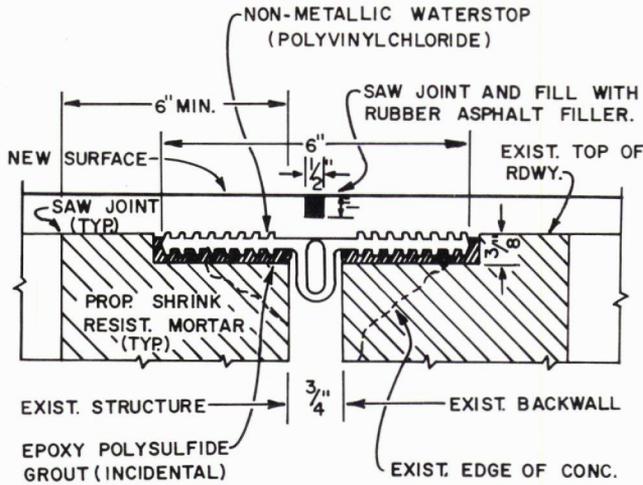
Cross-section of a nonmetallic waterstop installation as a part of a deck resurfacing project, Michigan State Highway Department.
